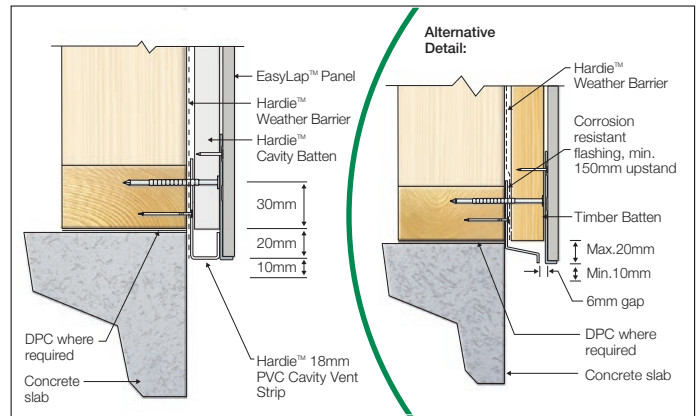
ALTERNATIVE SLAB EDGE DETAILS
